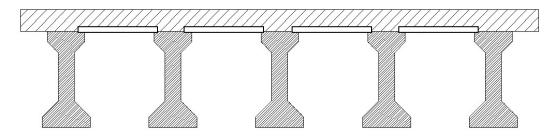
C - TYPICAL CROSS SECTION OF PRECAST I-BEAM WITH IN SITU SLAB
